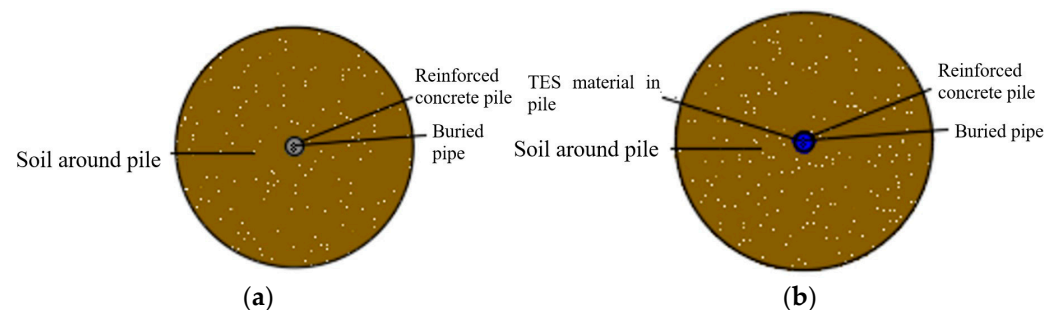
Position of TES materials in piles. (a) Reinforced concrete solid energy pile. (b) Energy pipe pile filled with TES material in reinforced concrete.
